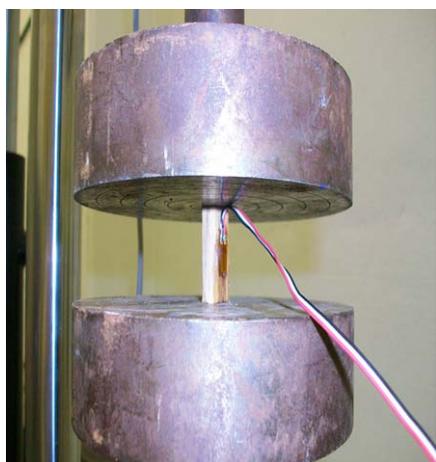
Chengqi Tulou Wall Rib Sample Being Tested under Compression at WVU
